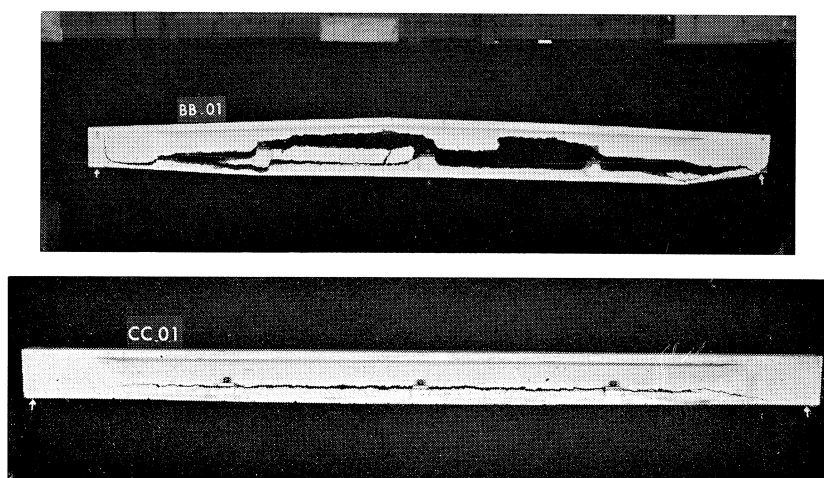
Two beams which were loaded through corbels and failed in consequence of the complete absence of stirrup reinforcement.
